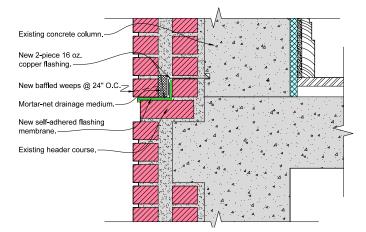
Opt. 1 "Restoration Approach" at Retrofitted Floor-Line Through-Wall Flsh'gs.
